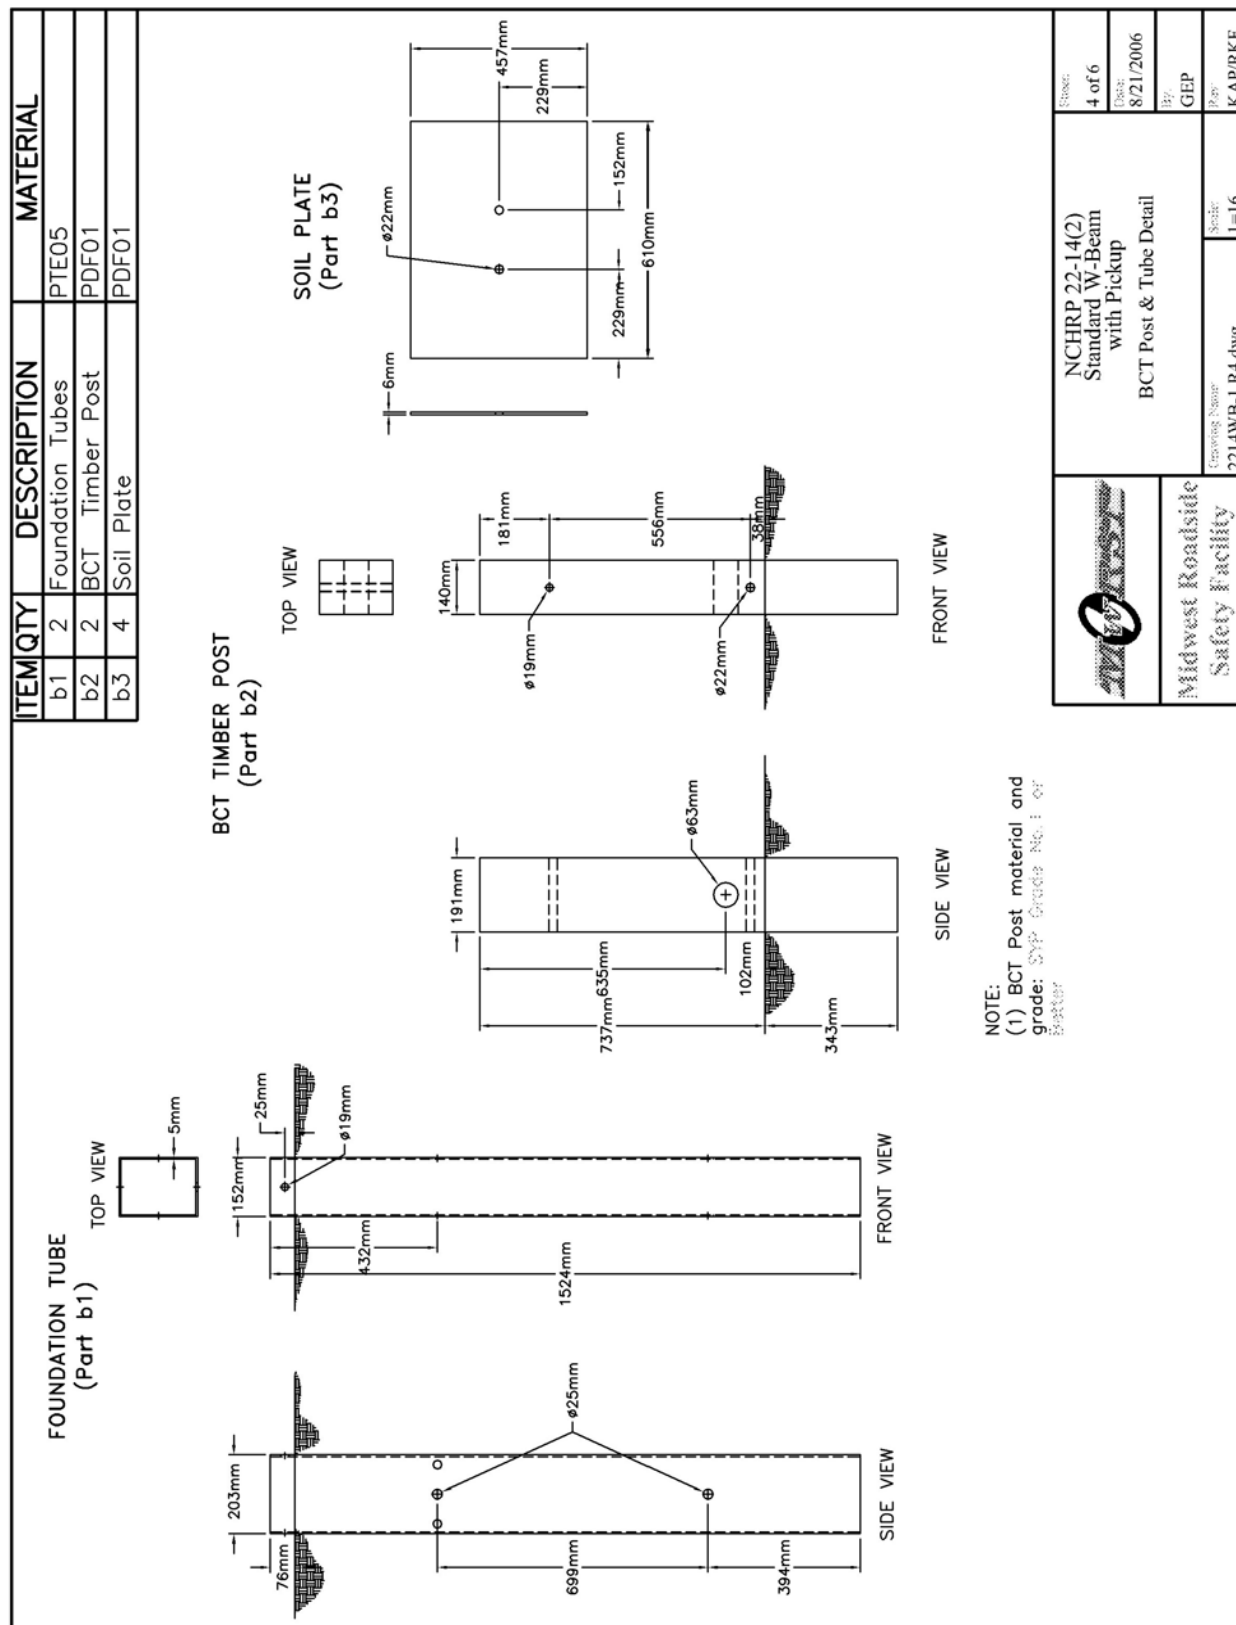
Standard Height, Strong Post, Wood Blockout W-Beam Guardrail Design Anchorage Details
